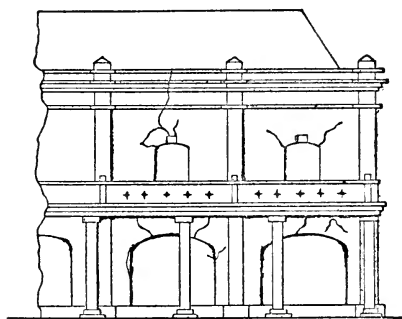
BRICK BUILDINGS IN TOKIO, SHOWING FRACTURES.
